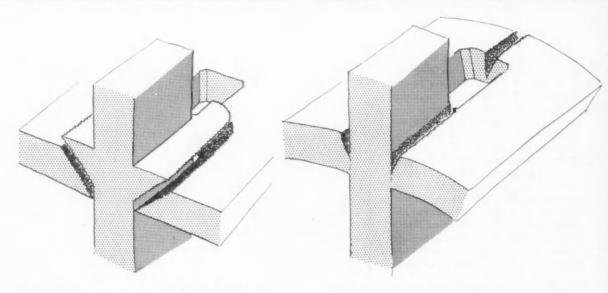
The familiar "diagonal Tension" failure of a flat plate, failure due to tensile stresses along a plane at 45 degrees to the planes of maximum shear, can be prevented by using diagonal reinforcing bars or vertical stirrups
